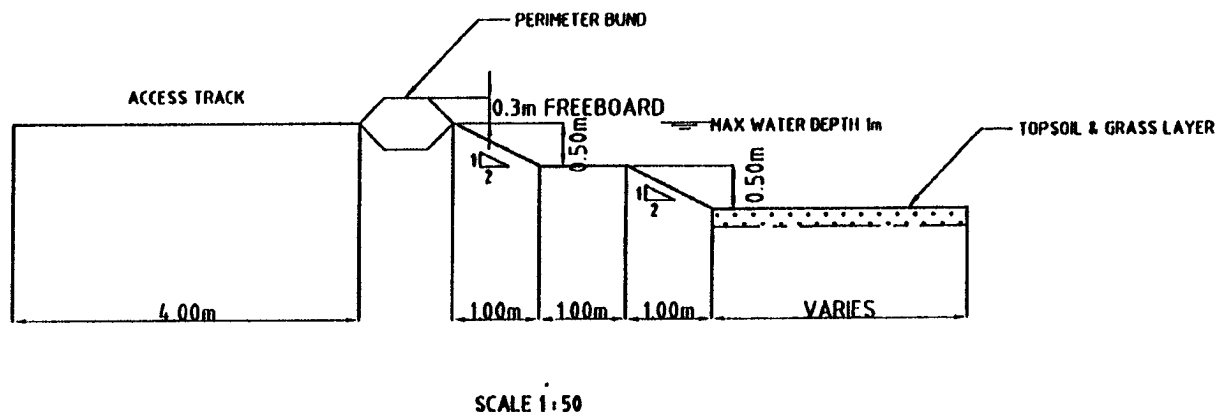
Infiltration Basin or Dry Pond Typical Bank Cross-Section
